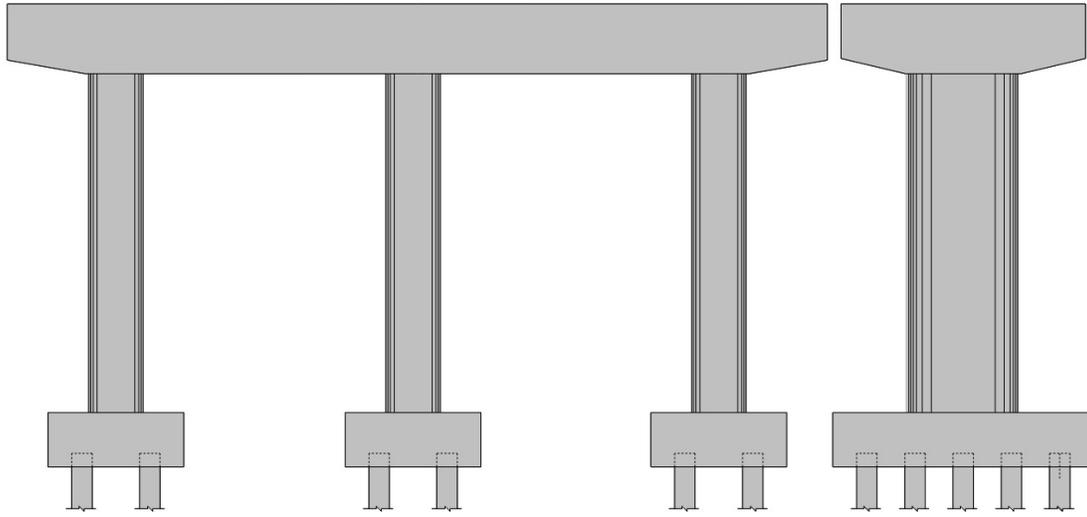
Proposed hammerhead piers will aesthetically complement existing piers.
